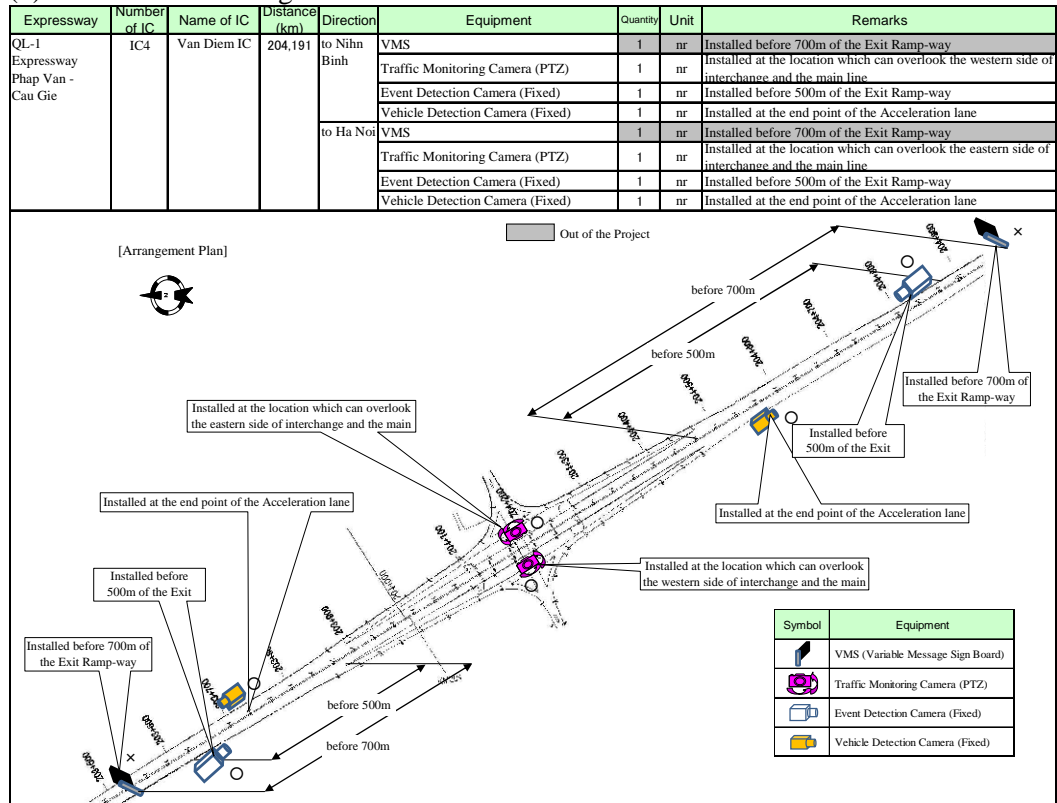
Equipment Layout Plan at Van Diem Interchange
